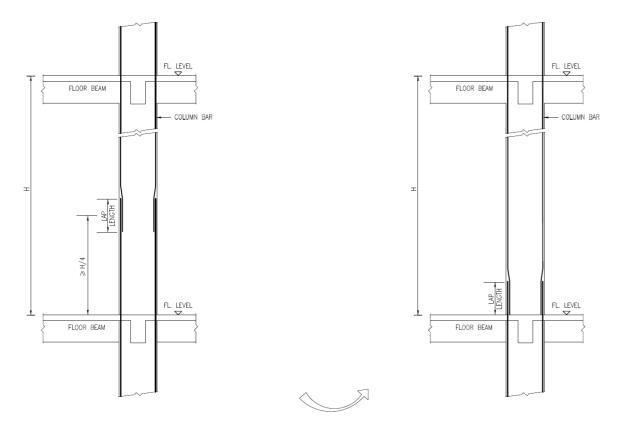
Column vertical bars to be lapped at floor level rather than at height
